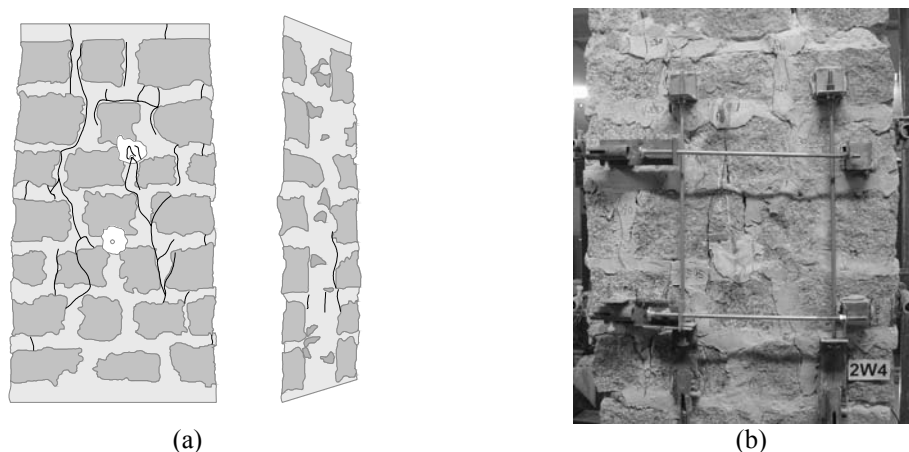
Failure of wall 2W4 (strengthened): (a) crack pattern close to failure; (b) relevant vertical cracking.
